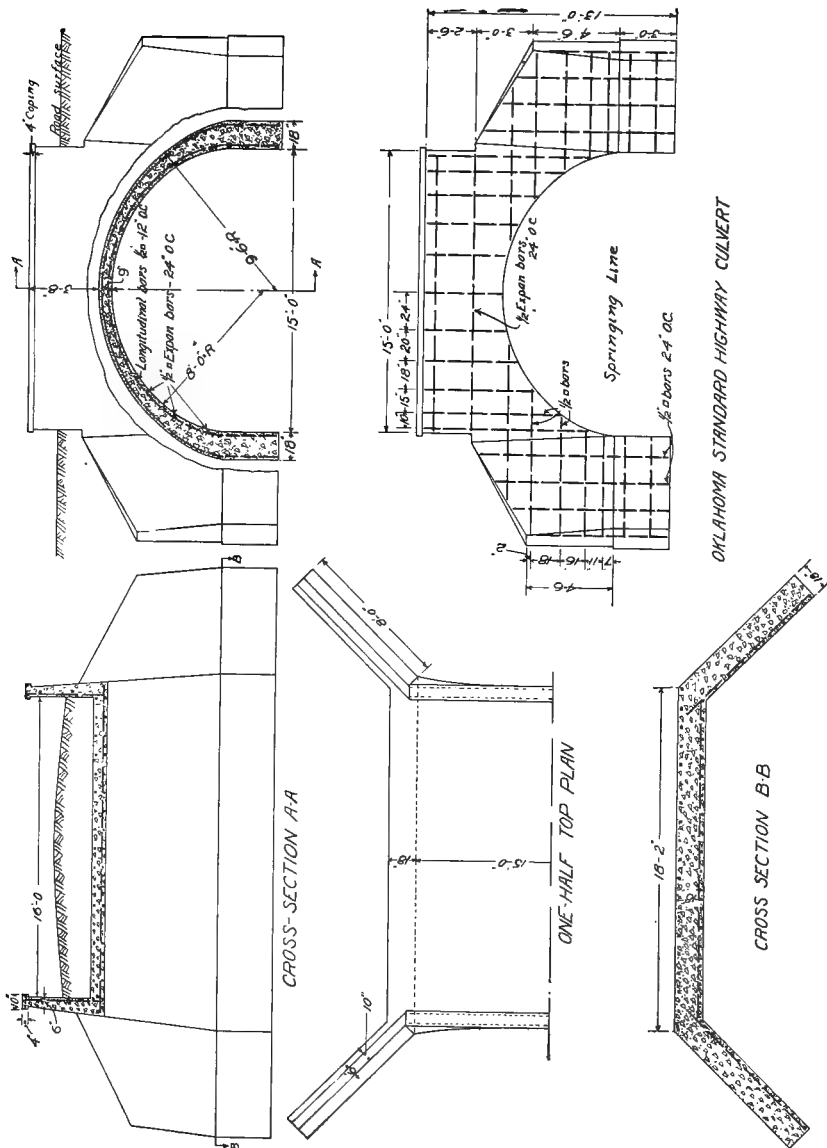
Standard Highway Culvert, Reinforced Concrete 15-foot Arch. Oklahoma State Highway.
